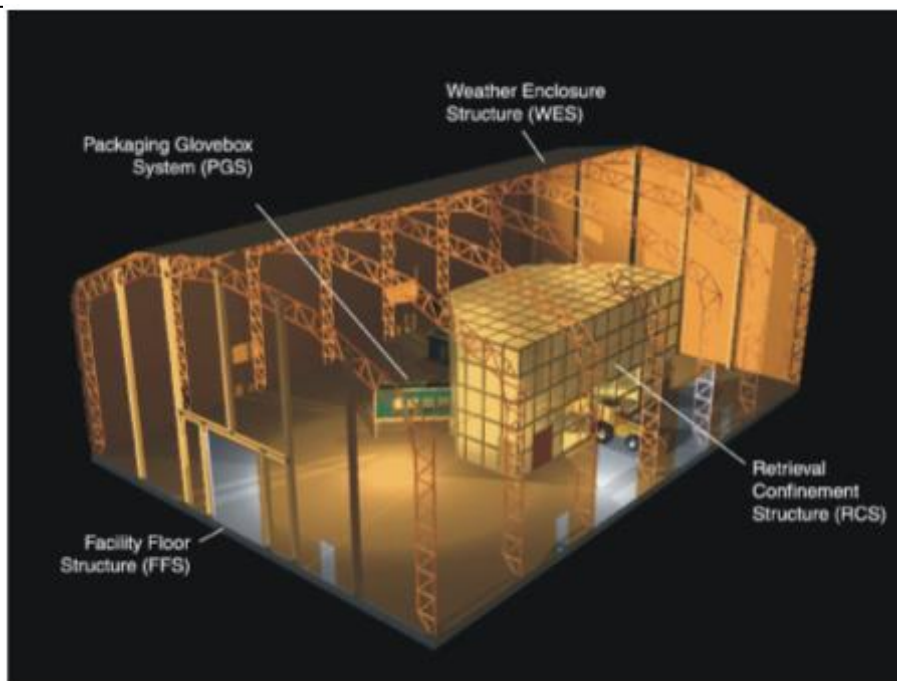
Artist rendering showing a cutaway view of the project facility (INEL, 2004)
